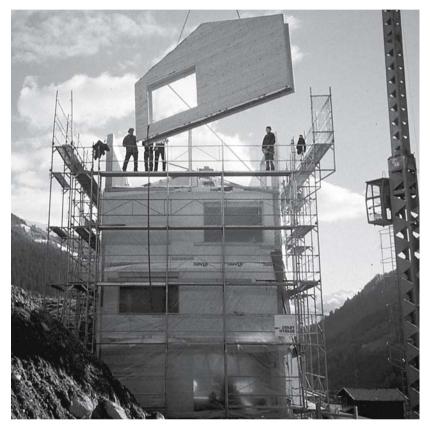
Solid timber panel building during construction Bearth & Deplazes: private house (Bearth-Candinas), Sumvitg (CH), 1998
